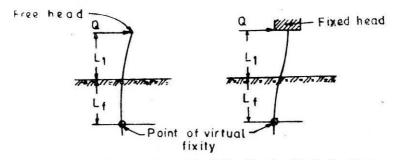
Piles Subjected to Lateral Loads Considered as Simple Cantilevers.
